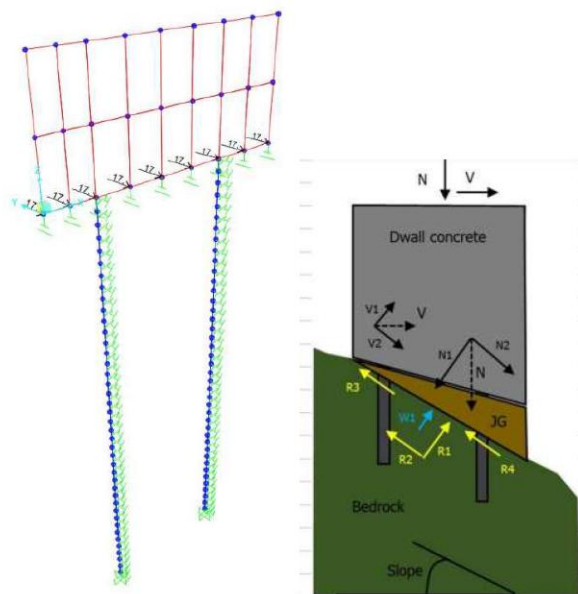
Structural model of diaphragm wall toe with steel piles and load transfer mechanism at the wall–pile–rock interface.
